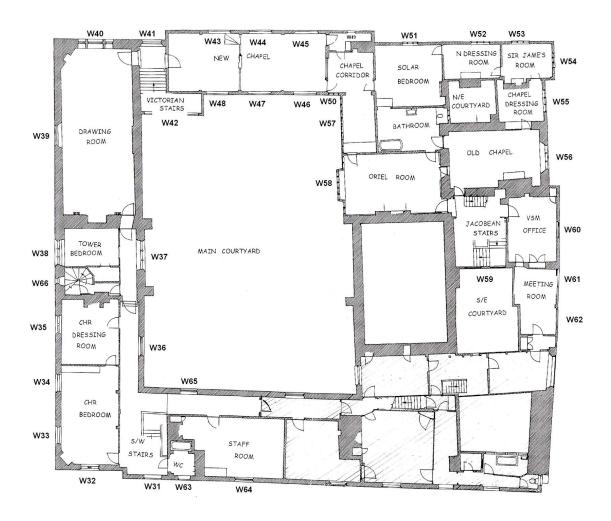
Plan of the first floor, Ightham Mote (© National Trust)
